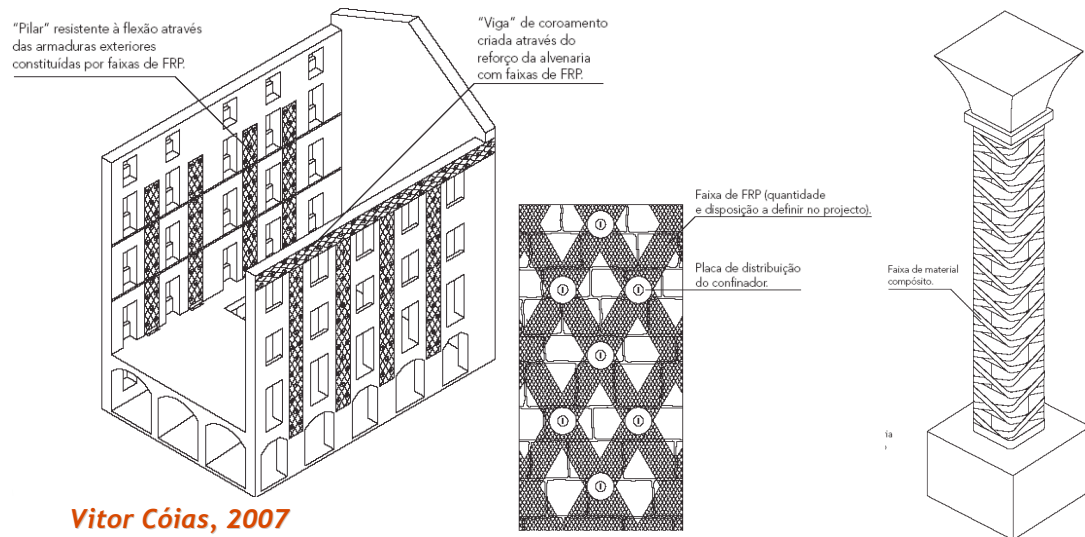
Application of CFRP/GFRP on a building, wall and column [Córias, 2007]
